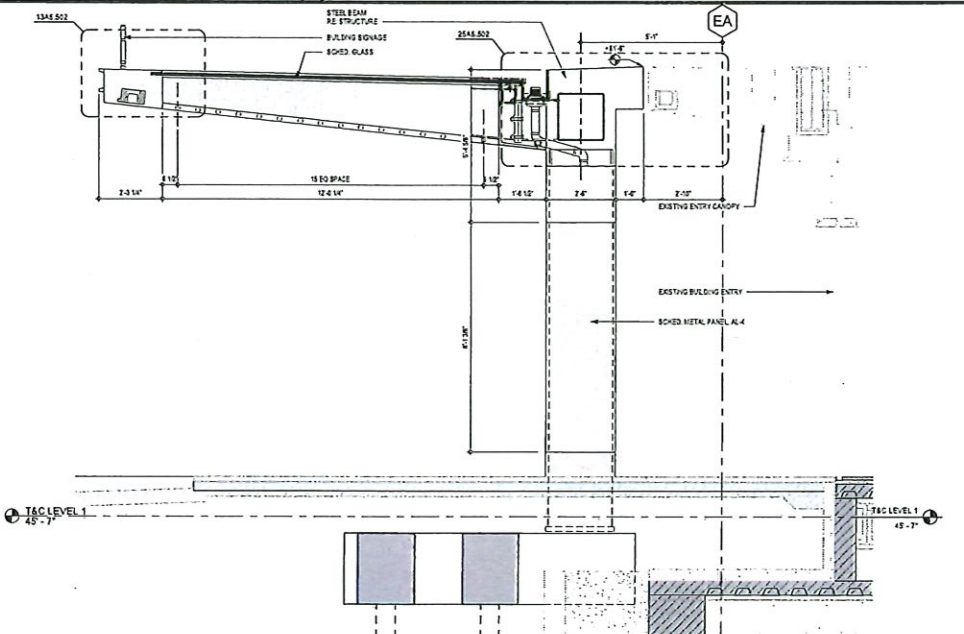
DETAIL - MASON ST CANOPY 3" = 1'-0" 23
